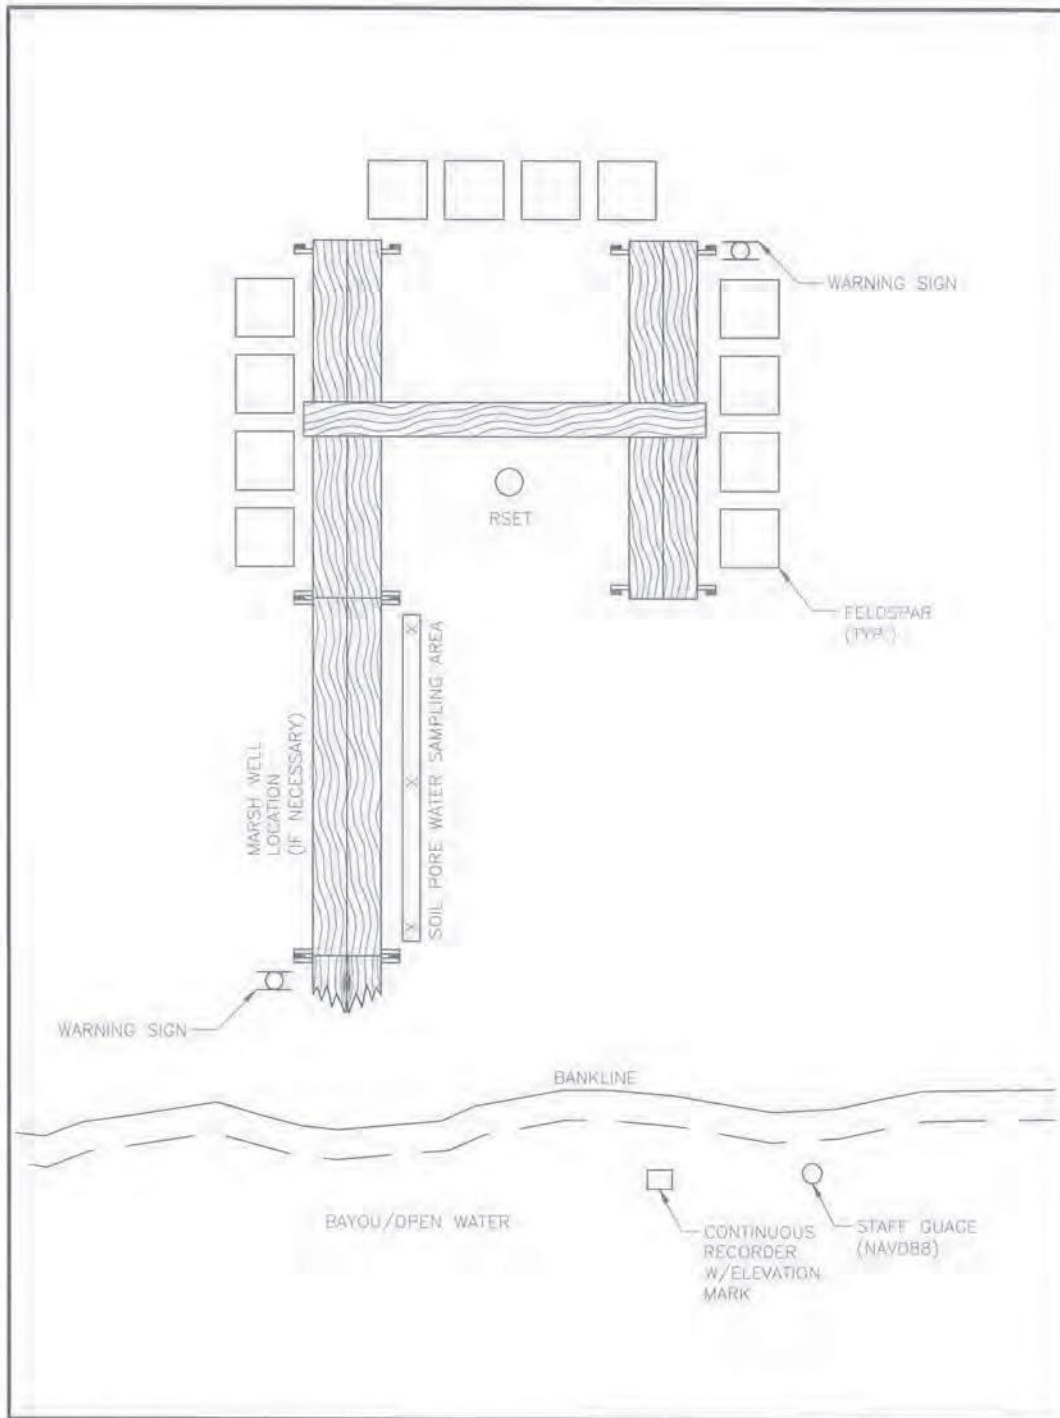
Typical layout schematic of the constructed site features at an attached marsh site.
